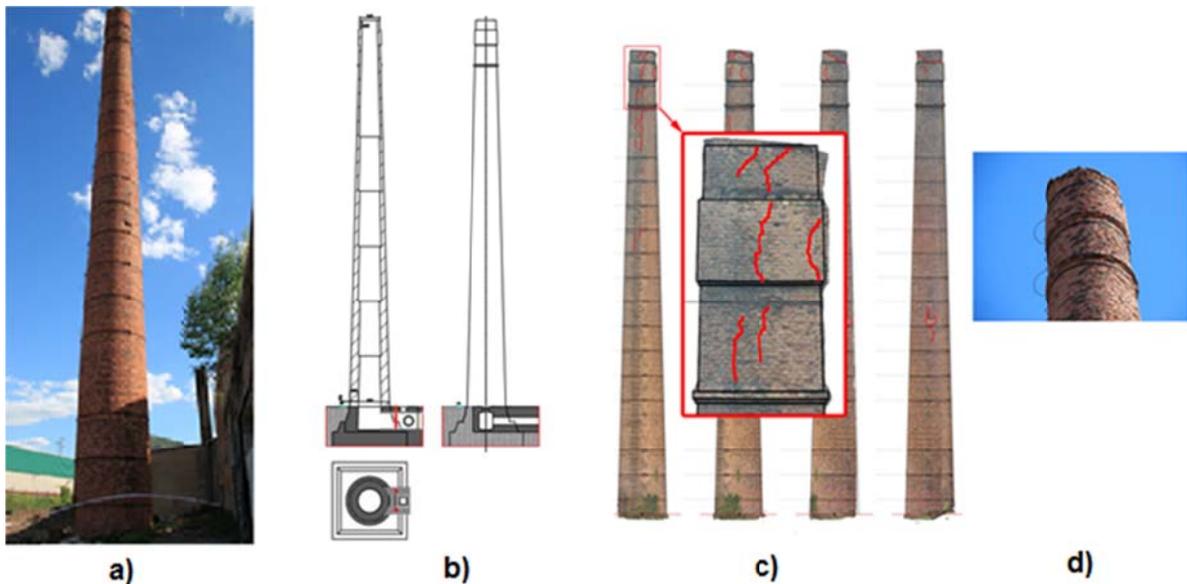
(a) The masonry chimney; (b) scheme including the foundation, (c) Condition of the structure; (d) detail of a deteriorated part of the chimney..
